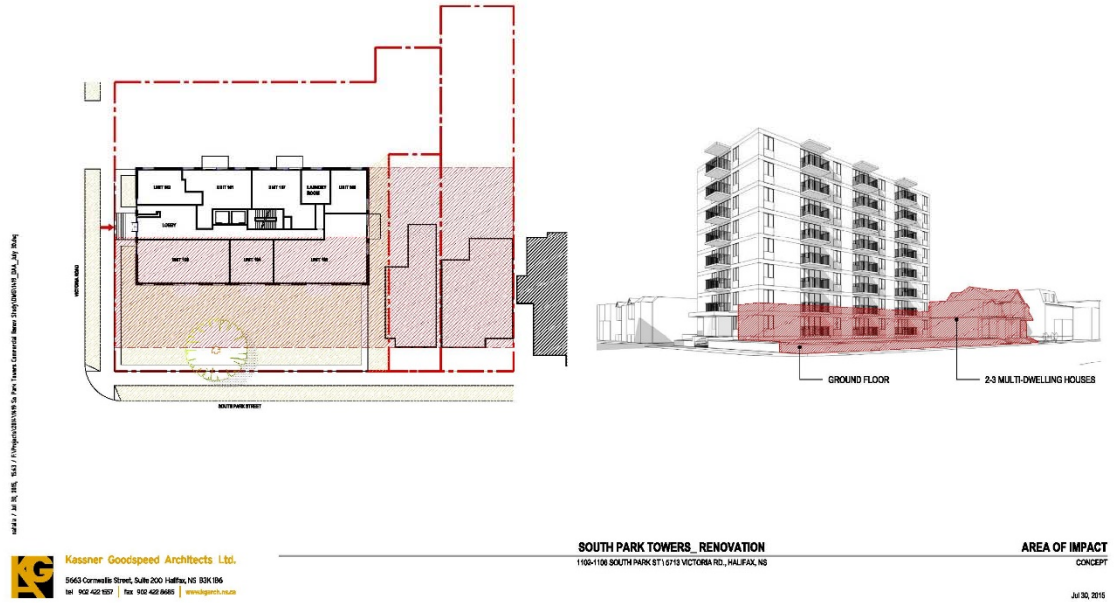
South Park Towers Redevelopment Rendering
